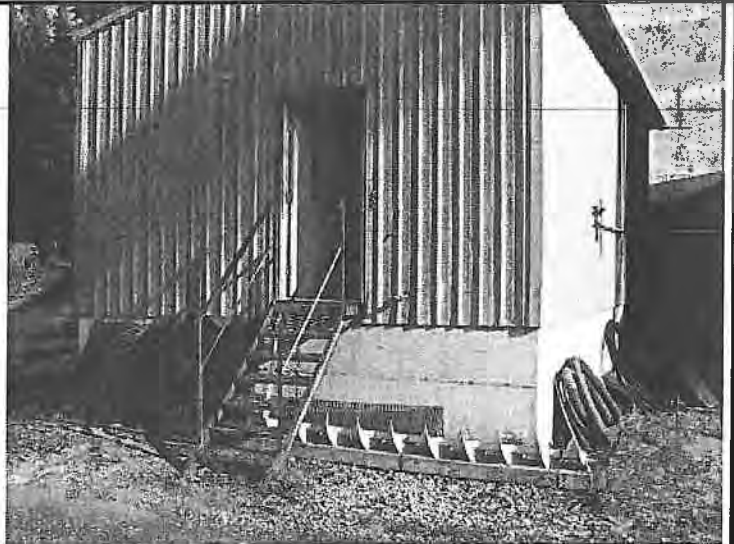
ADMIXTURES LOCATED INSIDE THIS STRUCTURE HAVE CONCRETE-WALLED CONTAINMENT.
